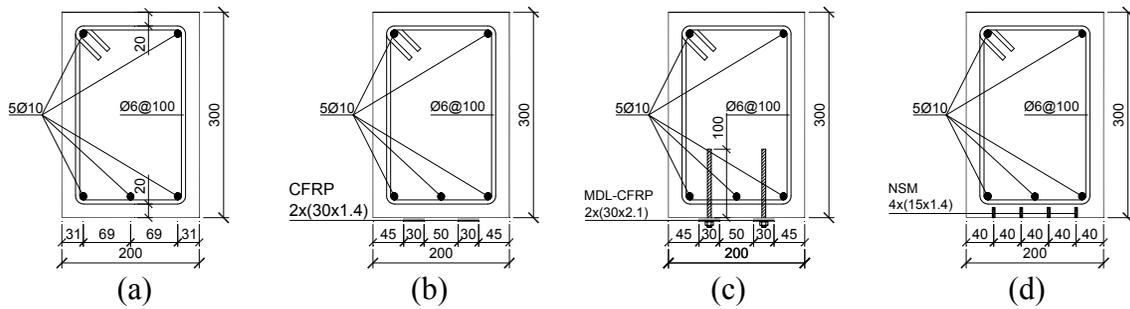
Cross section of the all beams: (a) REF; (b) EBR; (c) MF-EBR; (d) NSM. Note: all dimensions are in [mm].
